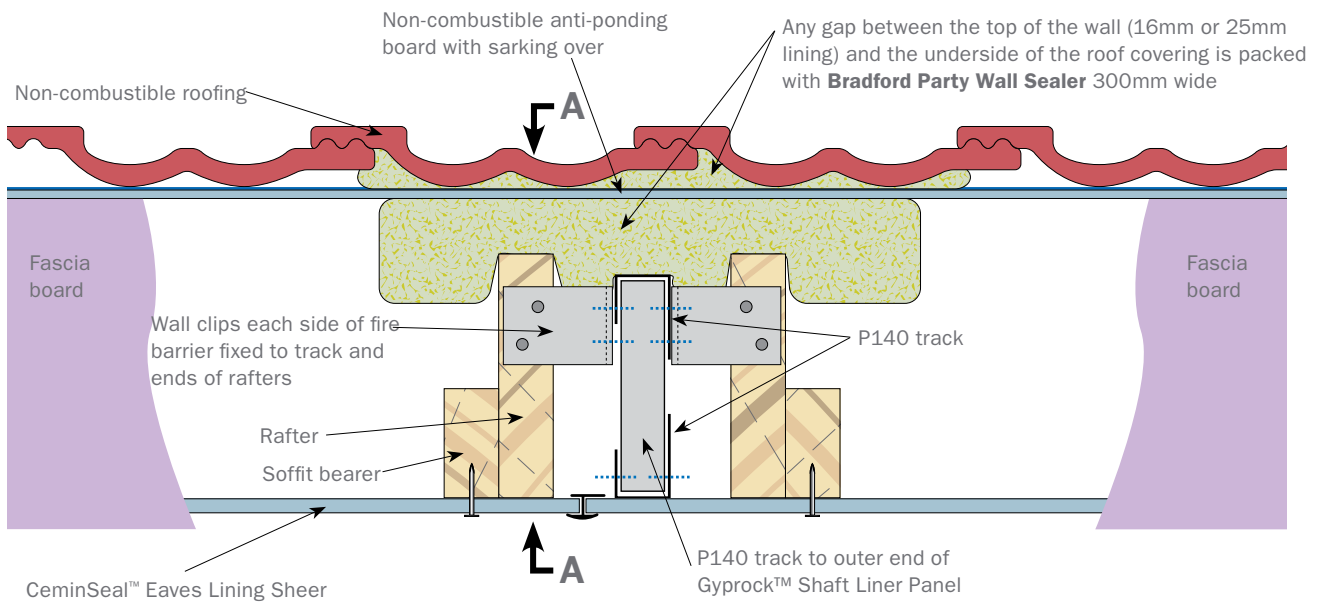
Typical eaves detail – Section B-B (Gyprock Party Wall)
